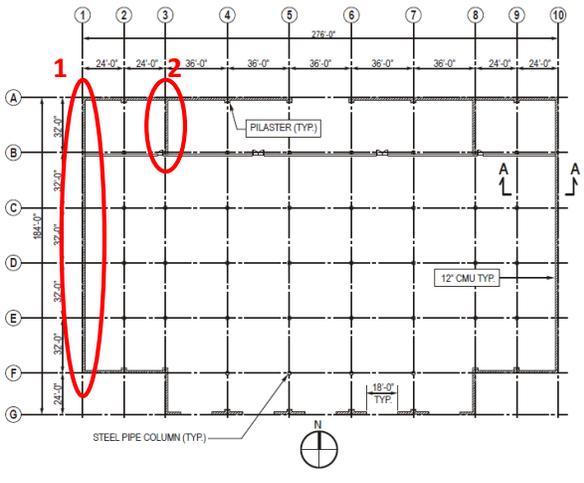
Floor Plan of Example Building (Not to Scale)
